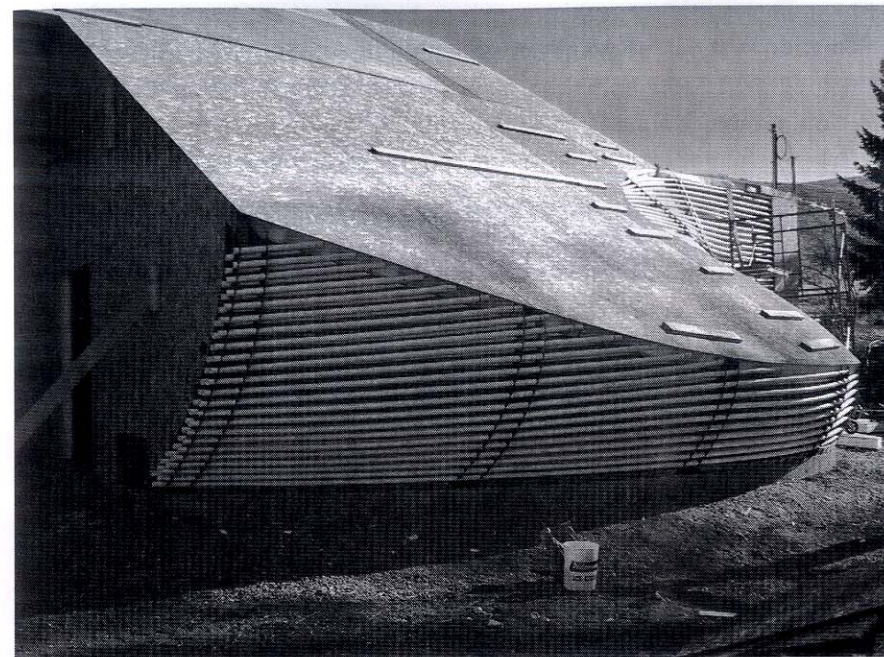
/ Aggregate PVC tube construction combined with overall stress-skin panel construction, Big Belt House, Willam Massie, White Sulfur Spring, Montana, 2000–2002
